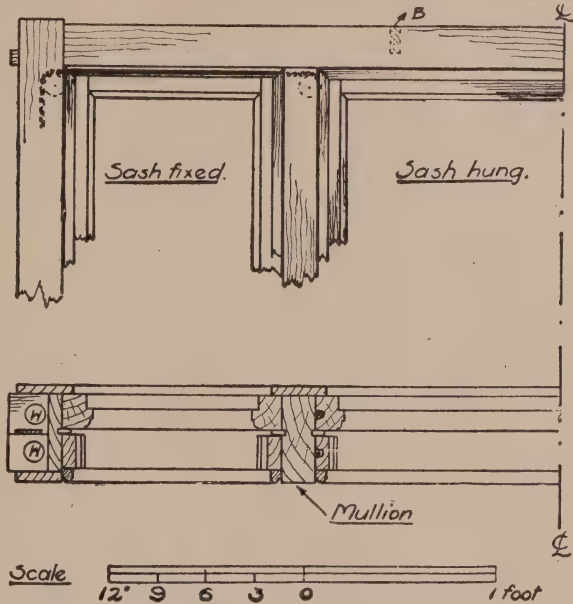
Part Section, Elevation and Plan of Mullion Window
